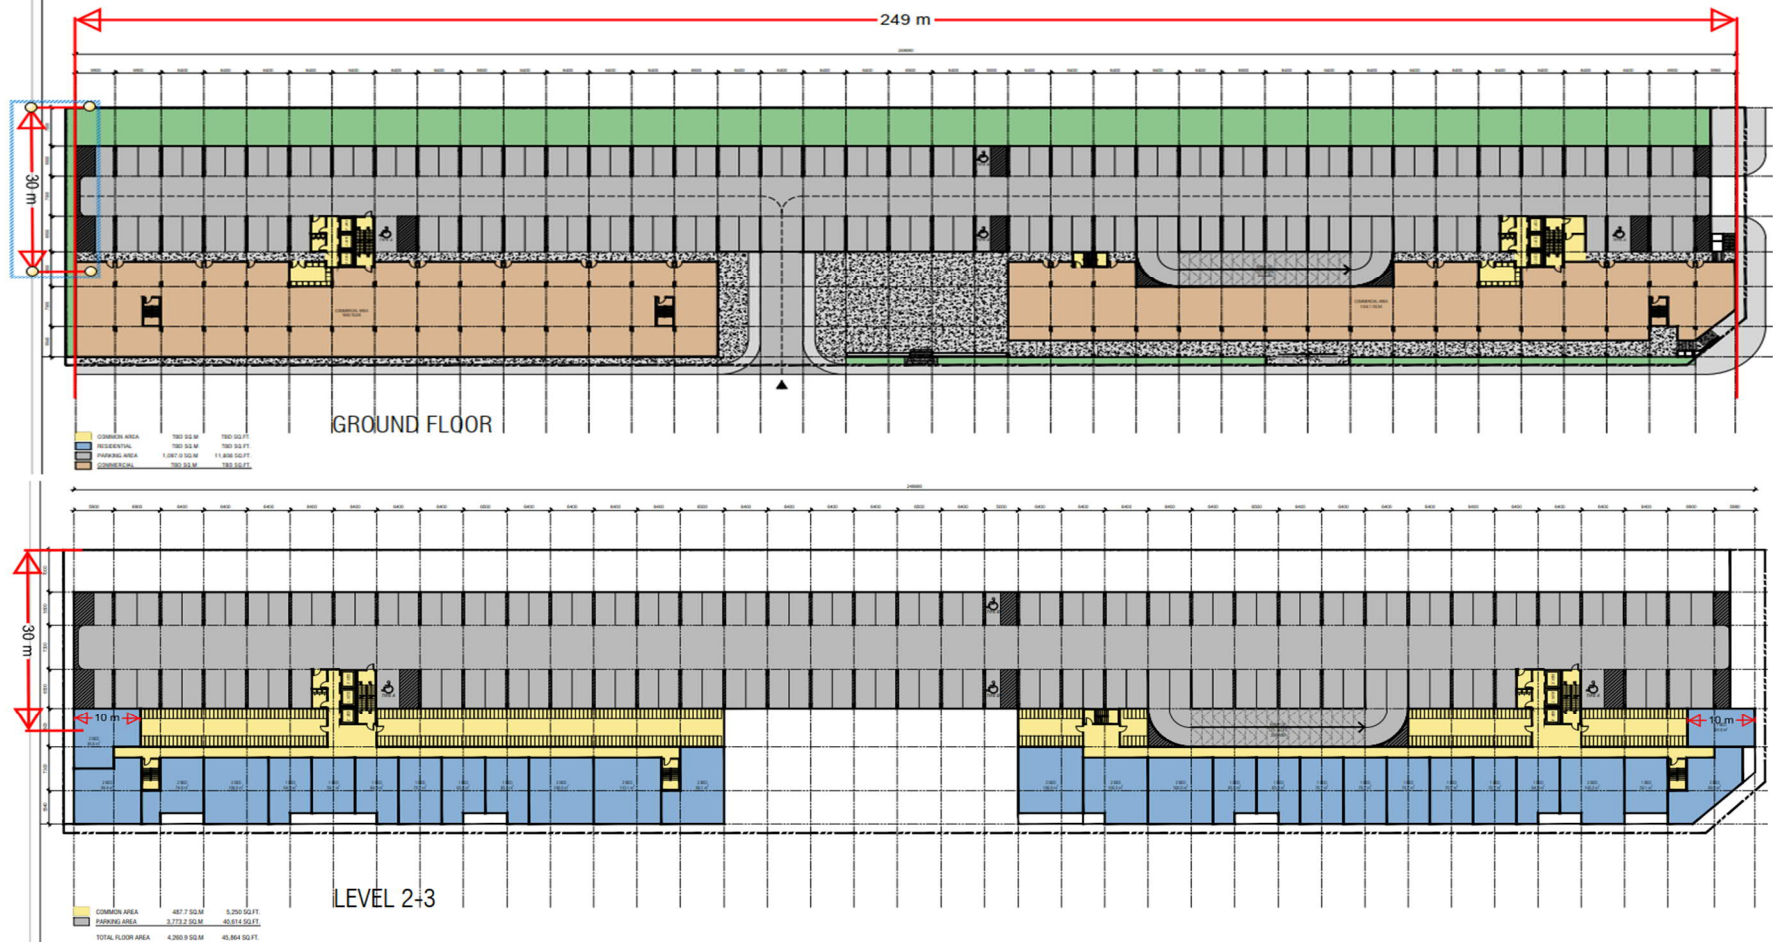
Site Plan of the Ground Floor (Top Figure) and Second (Bottom Figure) Levels of the Proposed Development Showing the Distance of the Building from the Mutual Property Line with the Guelph Subdivision – Parking, Commercial Spaces and Two Residential Units are within the 30 m Setback form Rail Operations
